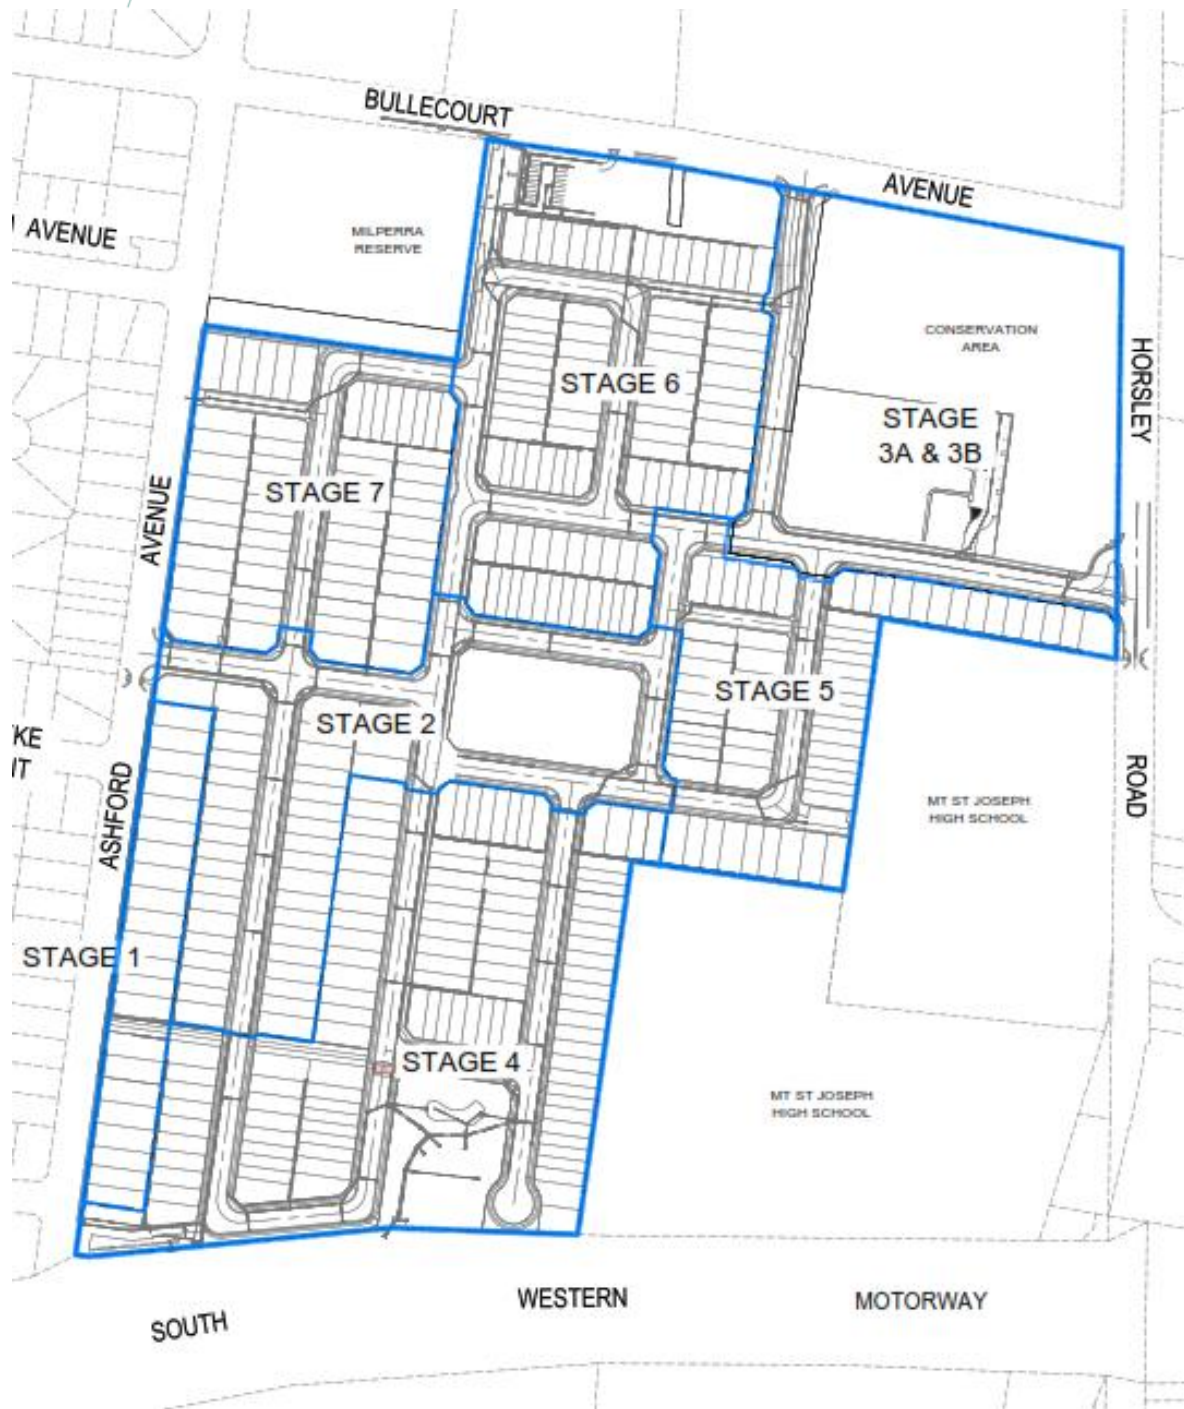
Overall Layout Plan (Source: Beveridge Williams).
